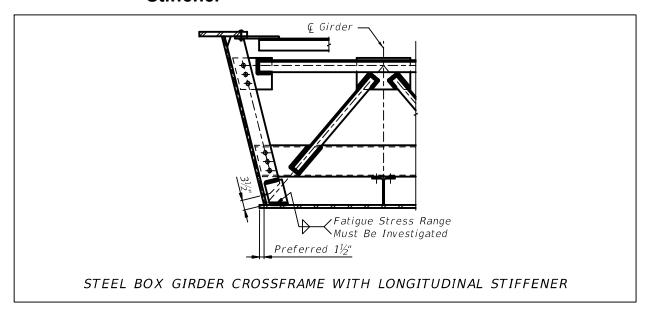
Steel Box Girder Internal Cross-Frame
